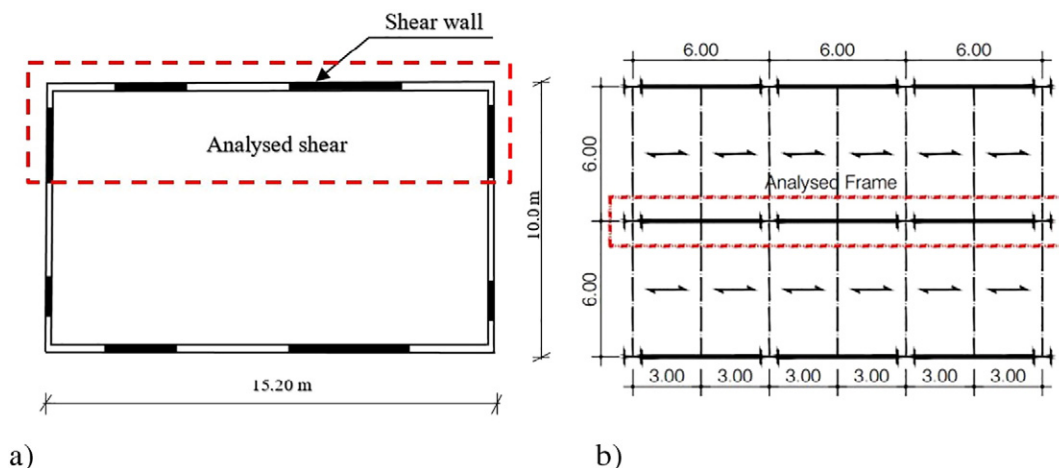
Plan view of: a) CFS-SWP and b) MRF buildings.
